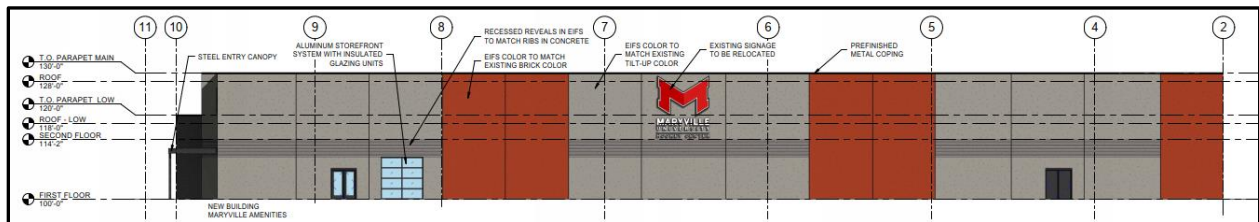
Side Elevation, north, Maryville Amenities Building Only (EIFS WALL) – will eventually be removed for third rink
